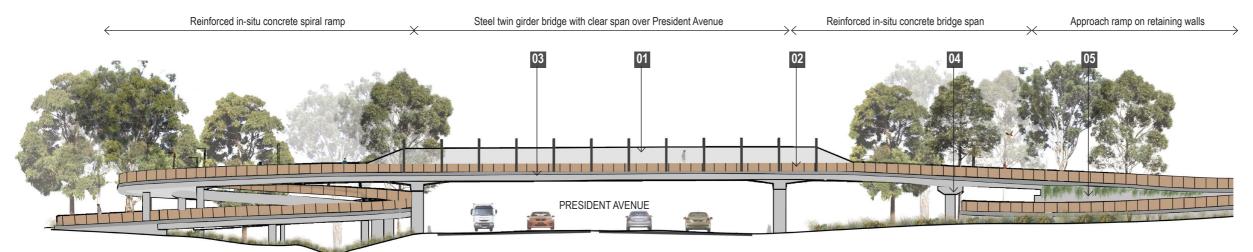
President Avenue Bridge - long elevation AA. Scale 1:500
